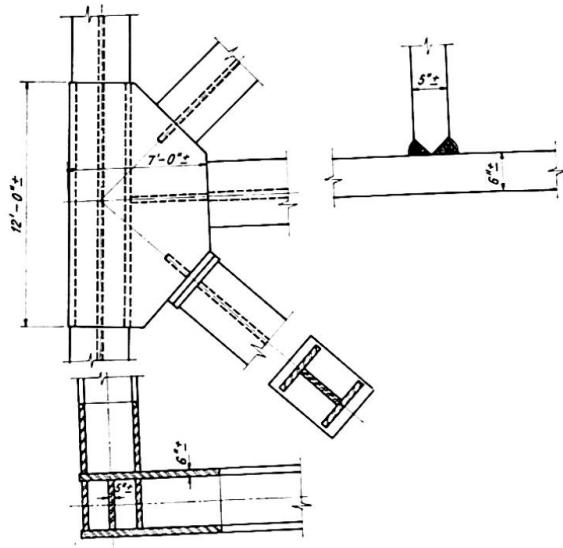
Schematic Joint Detail for Optimum Truss Type Structures
